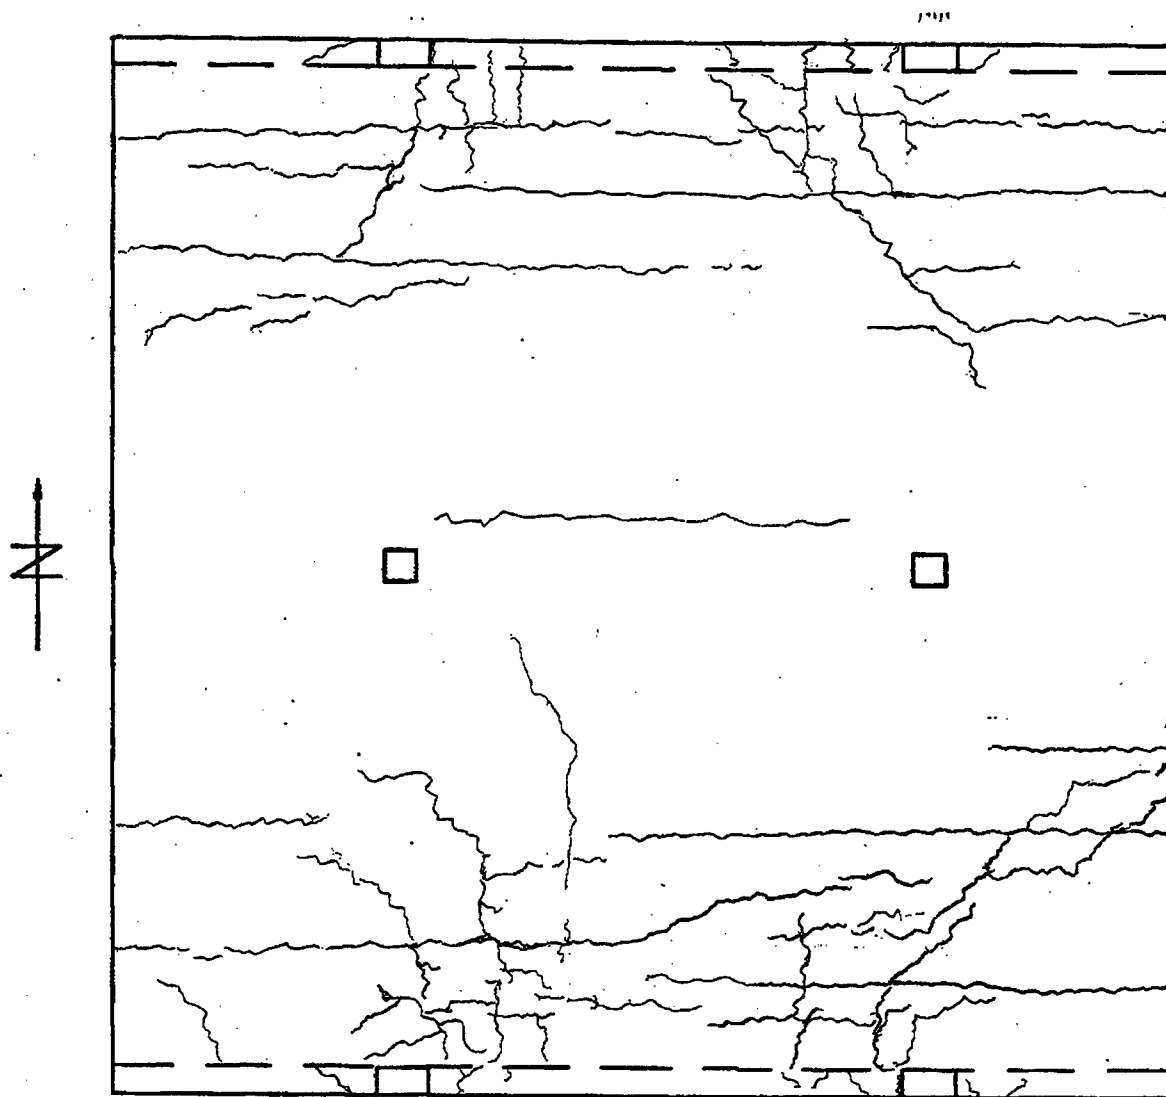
Crack Pattern, First Floor Slab, Bottom Side, Pre-Test
